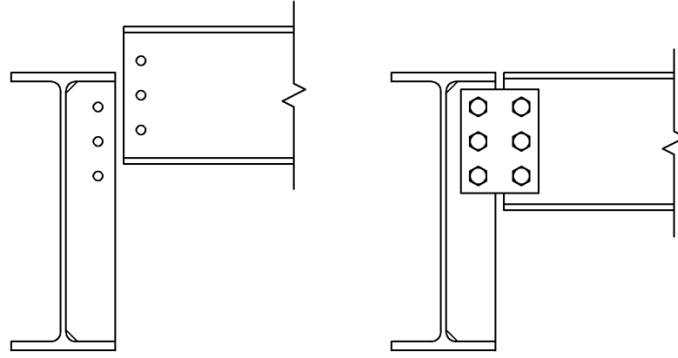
Installation Method for Side Plate Connections (Configuration 8)
